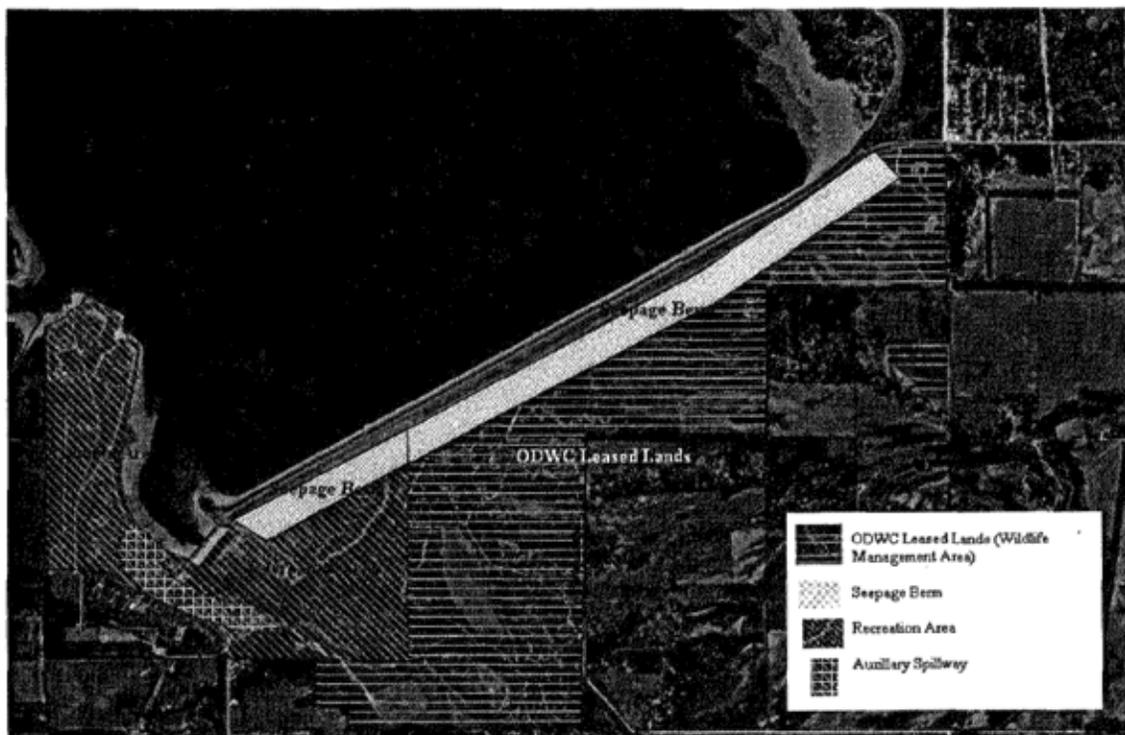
Proposed location of auxiliary spillway, fuse gates, and reinforcement berm at the toe of the dam embankment.
